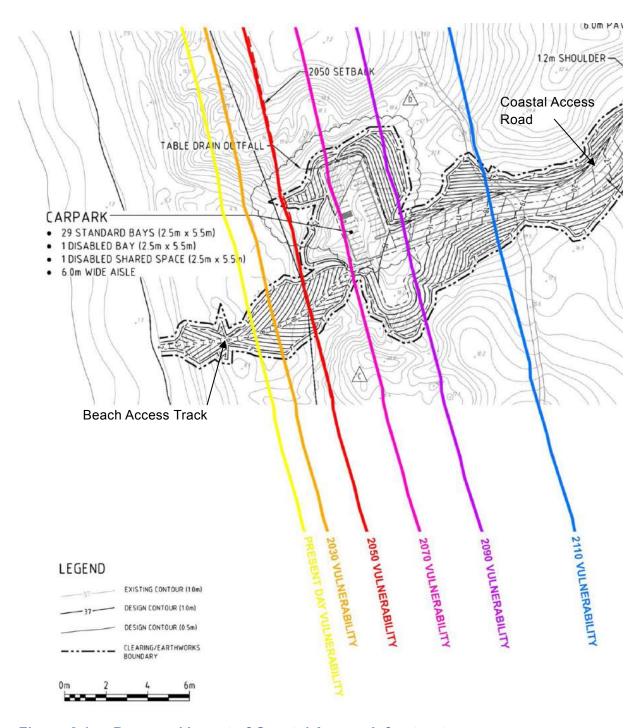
Proposed layout of Coastal Access Infrastructure
